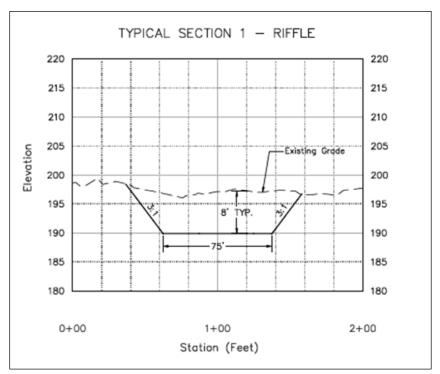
Proposed Excavation Cross-section (DOWL, 2017)
